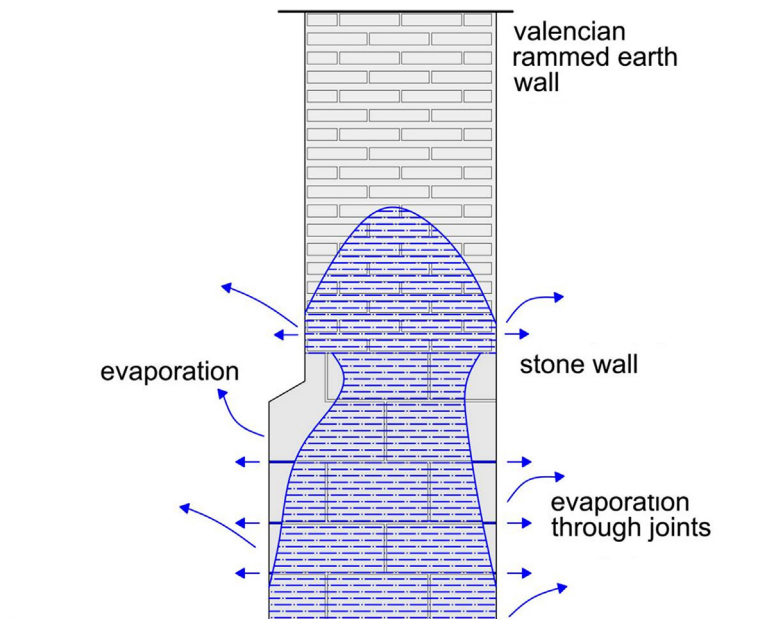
Capillary rise in a stone and rammed earth wall.
